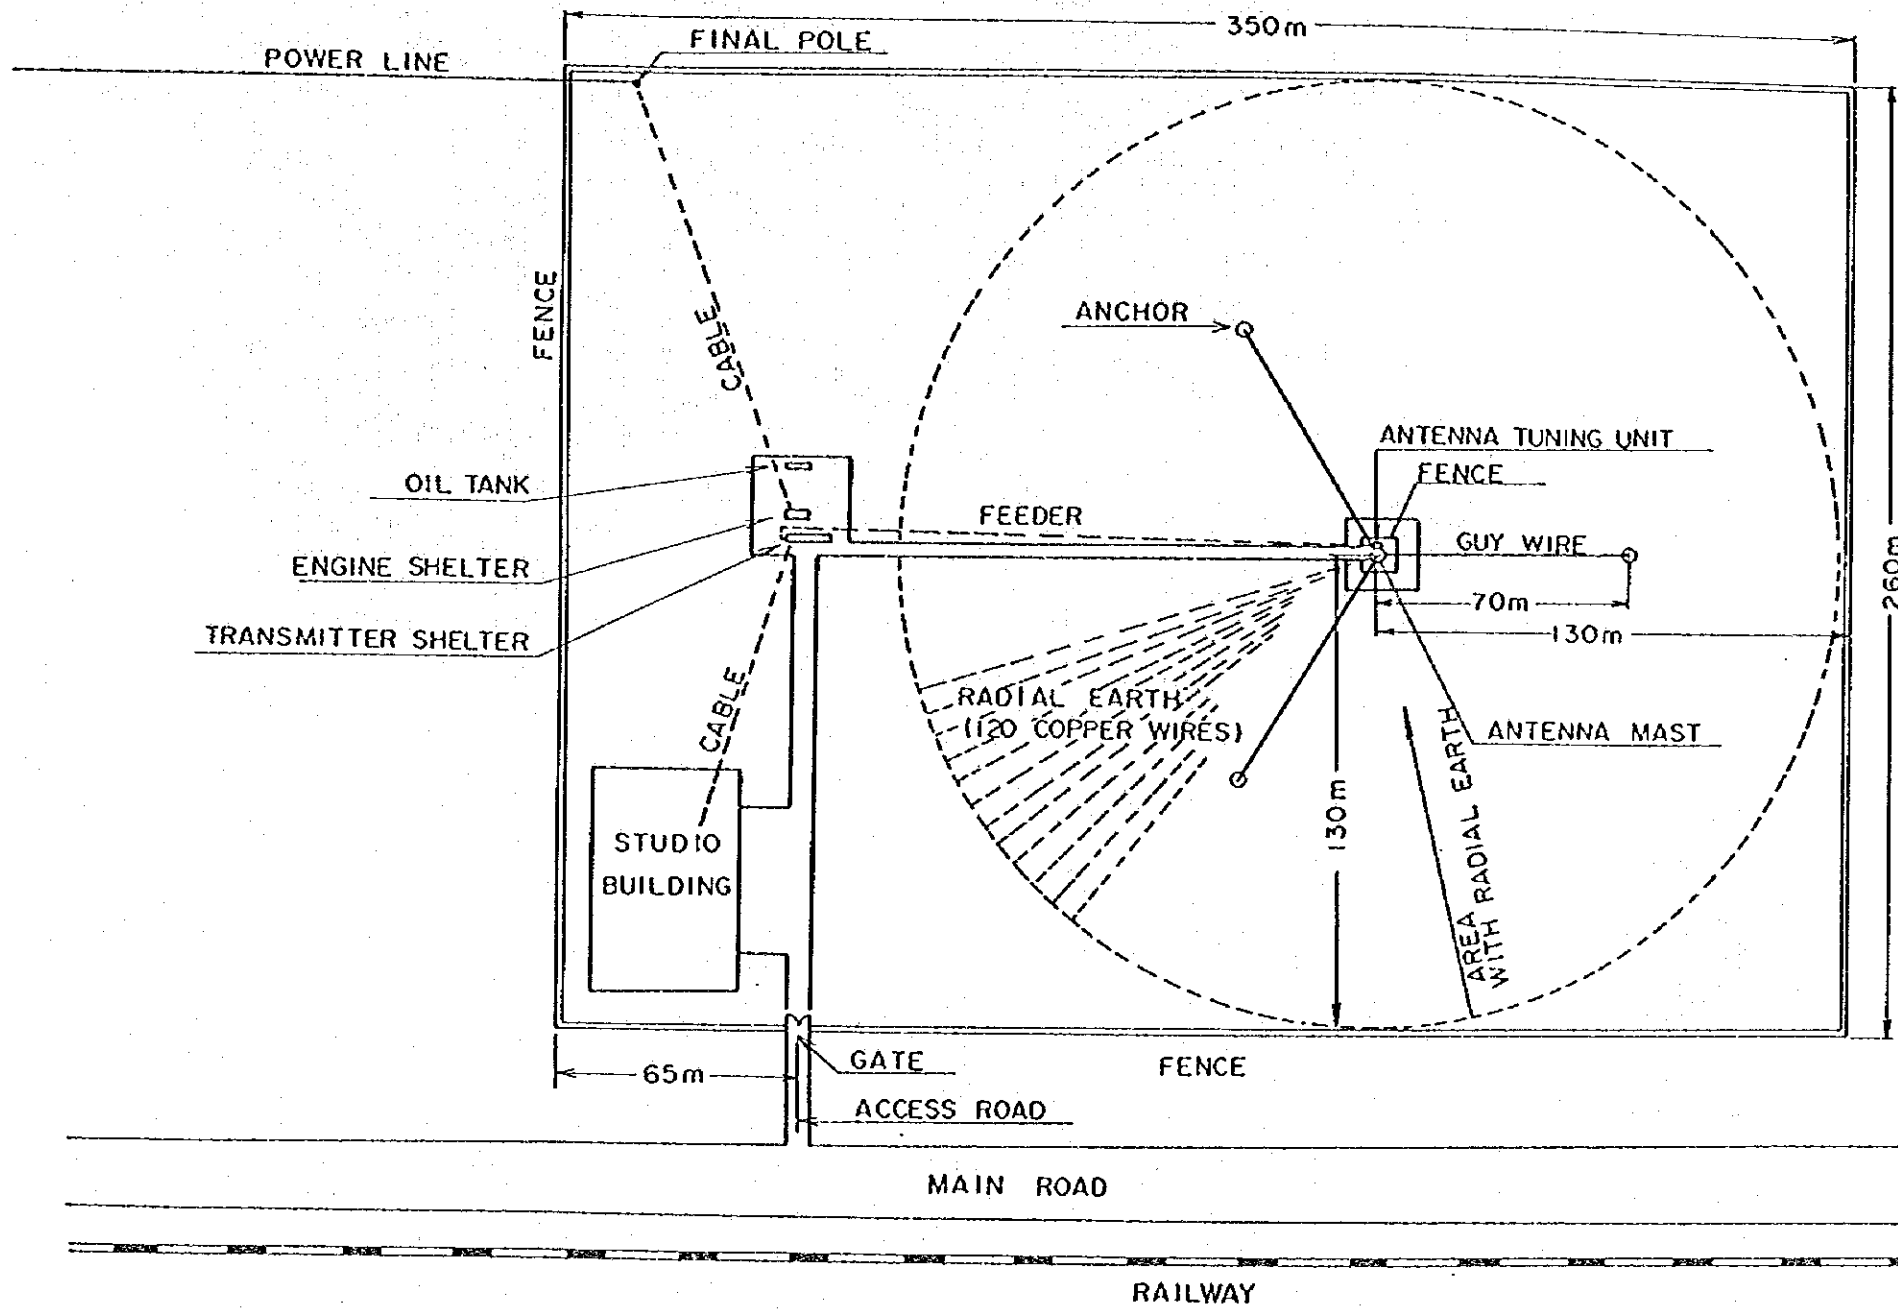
Site Plan for Wadi Halfa Transmitting Station
